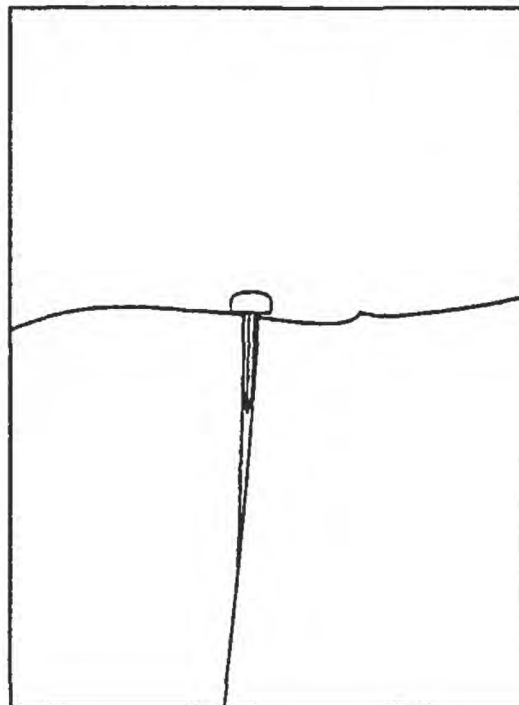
Schematic drawing of an installed PK nail used as a temporary bench mark. The nail can be 20 to 50 millimeters in length.
